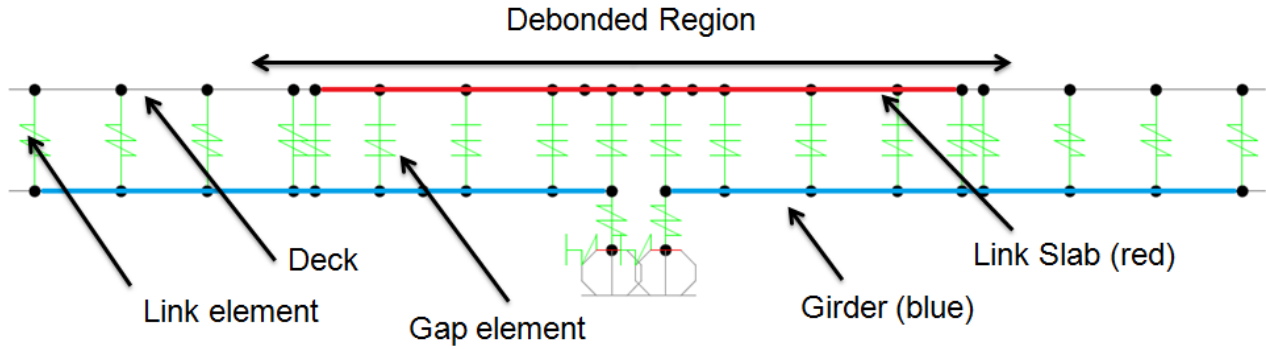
SAP2000 model with the bridge detail at the pier support
